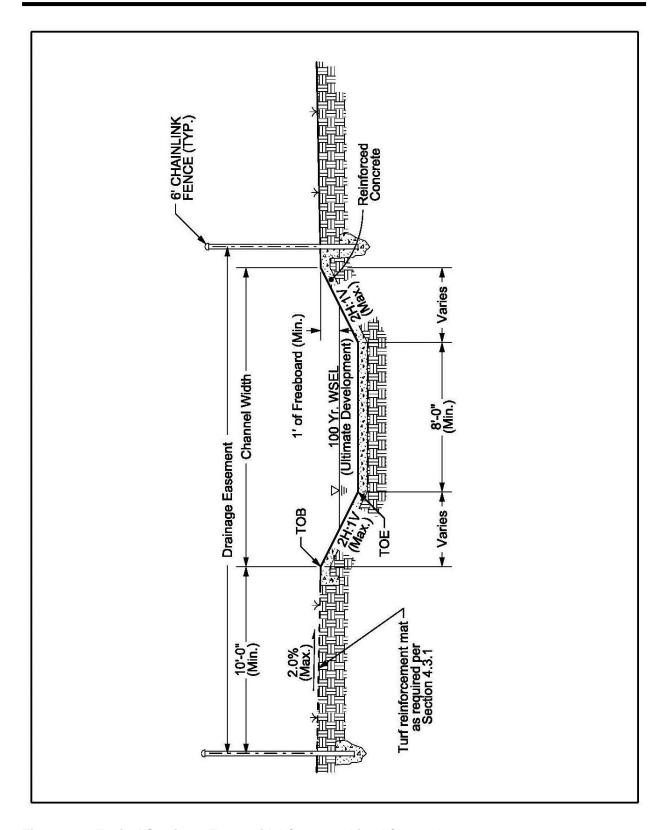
Typical Section – Trapezoidal Concrete-Lined Channel
